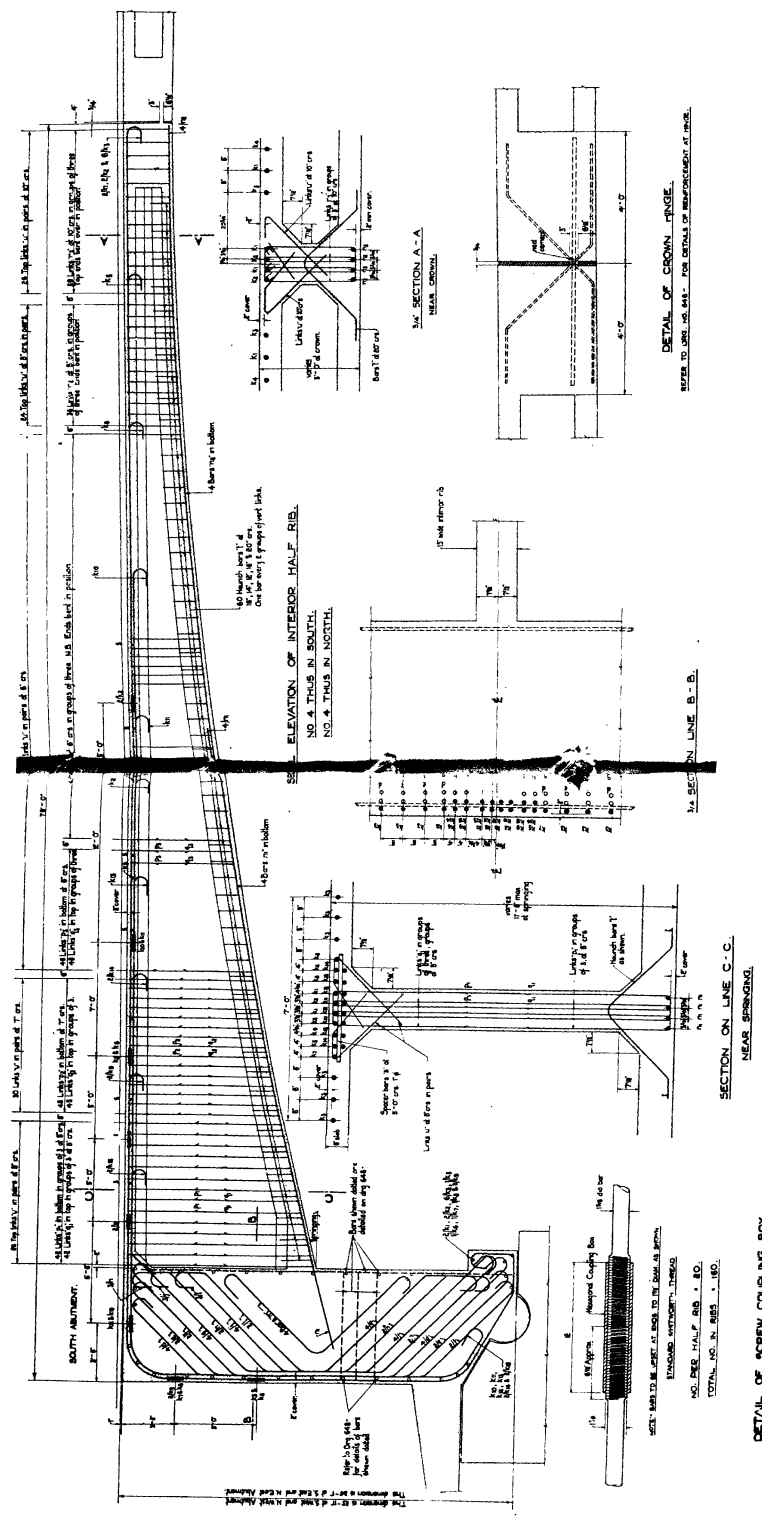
NEW BRIDGE AT BRIDGE OF ALLAN: DETAIL INTERIOR RIB. (The key to the bars is given in Fig. 172.)
